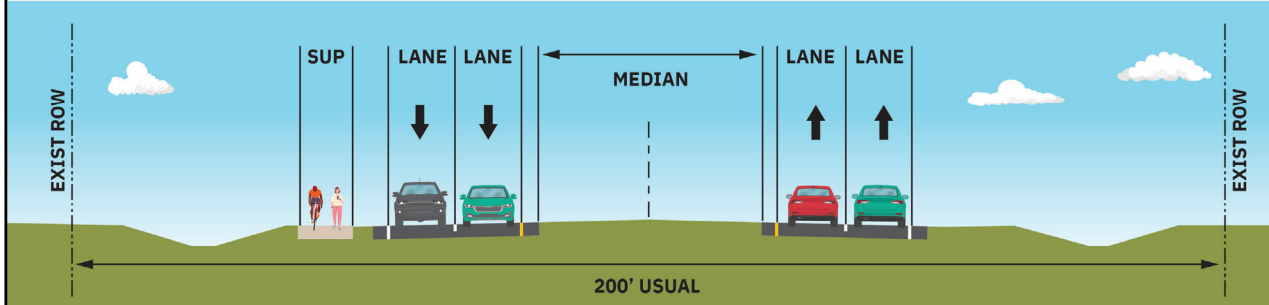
FM 156 proposed interim typical section shows four 12-foot wide travel lanes, a center median, 2-foot offset, and a 10-foot wide shared-use path on the southbound side of the facility. The proposed usual right of way width is 200 feet.
